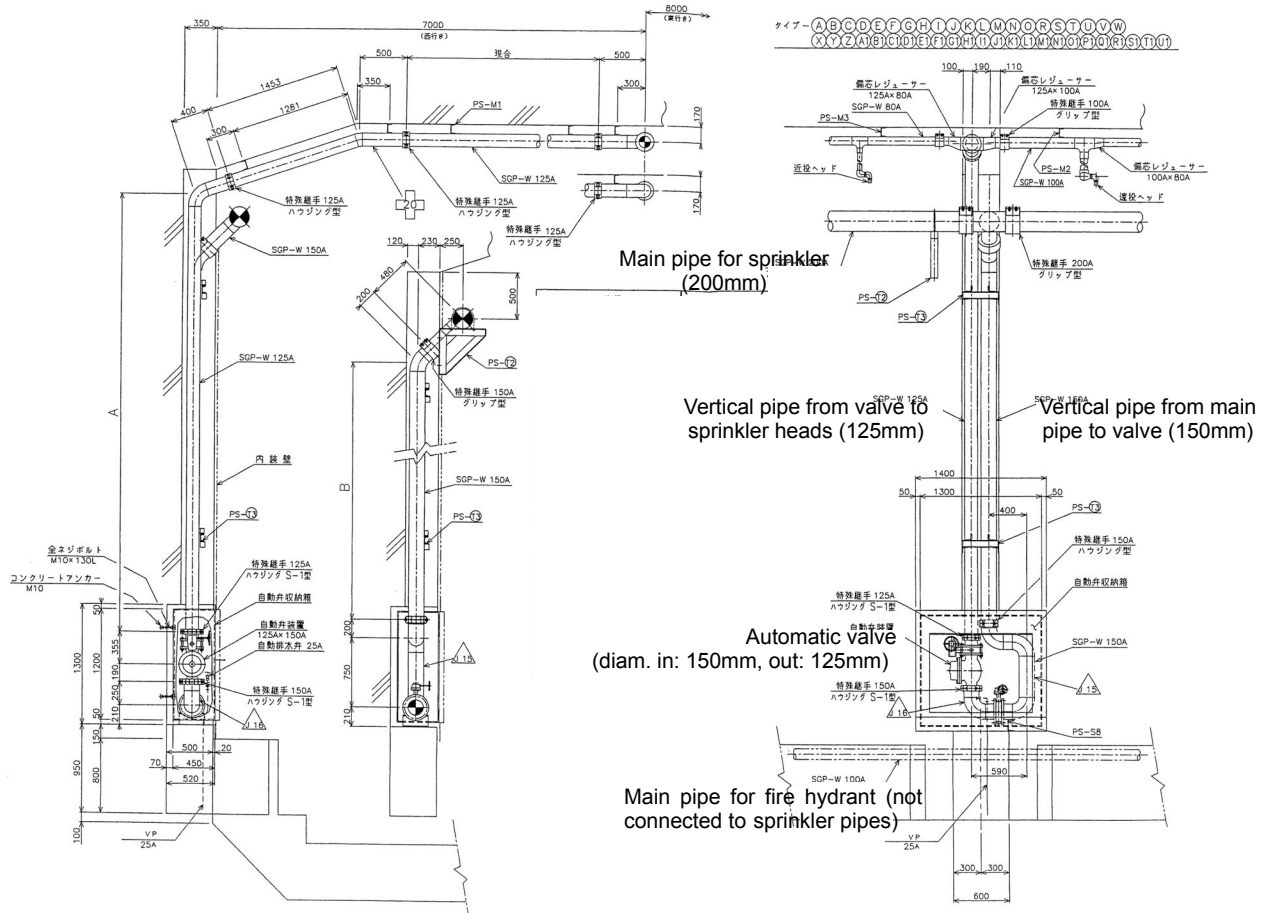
Example of sprinkler installation at ceiling (MEPC)
